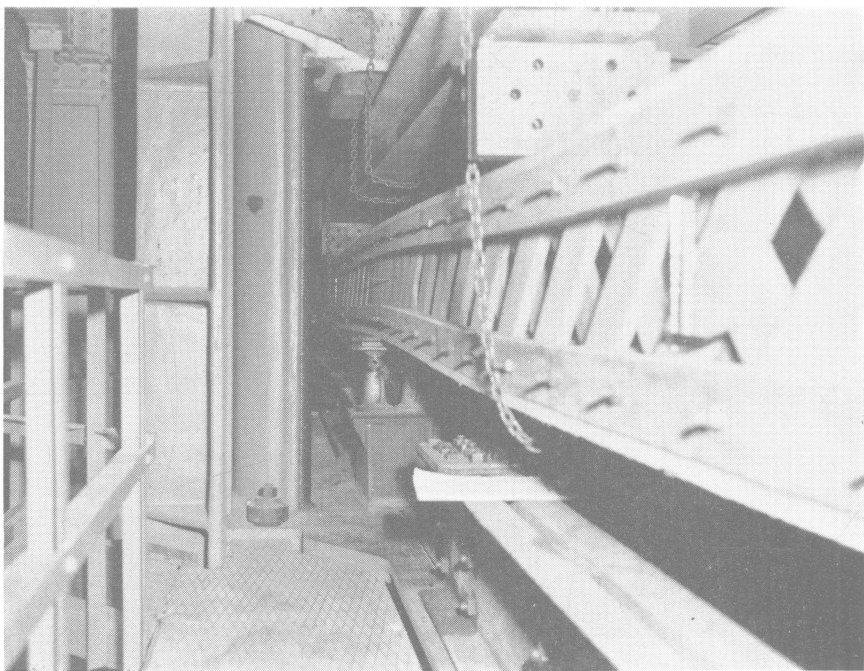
One of the continuous lattice beams being tested in the Engineering Experiment Station Laboratory.
